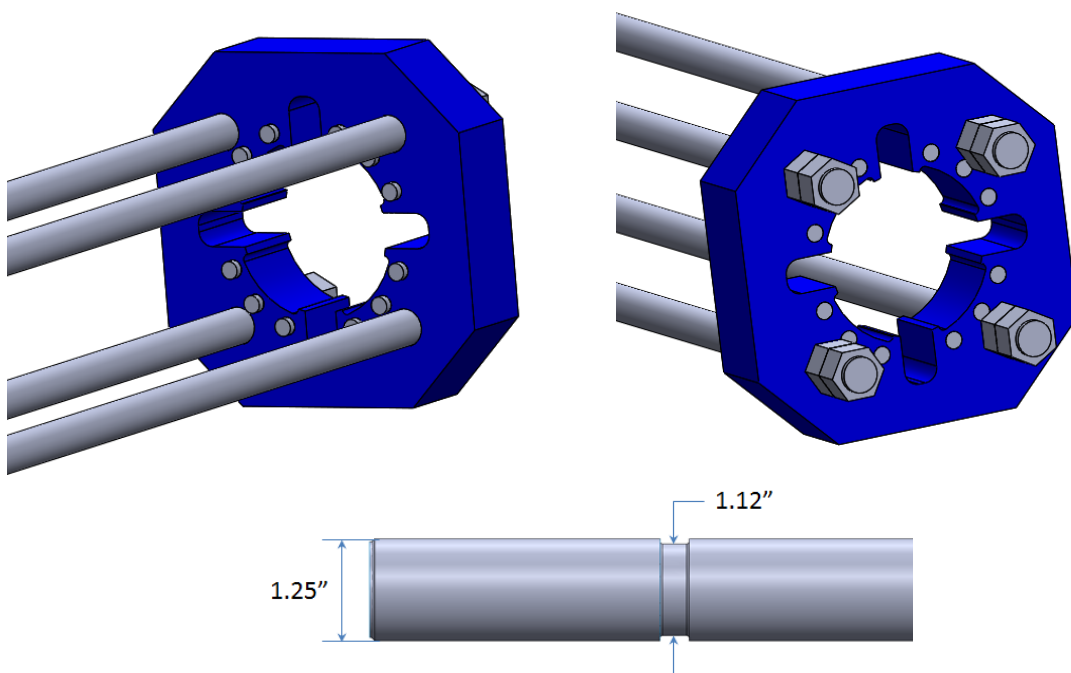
Endplate assembly and the thread relief dimension on the rod (rod drawing see Appendix I)
